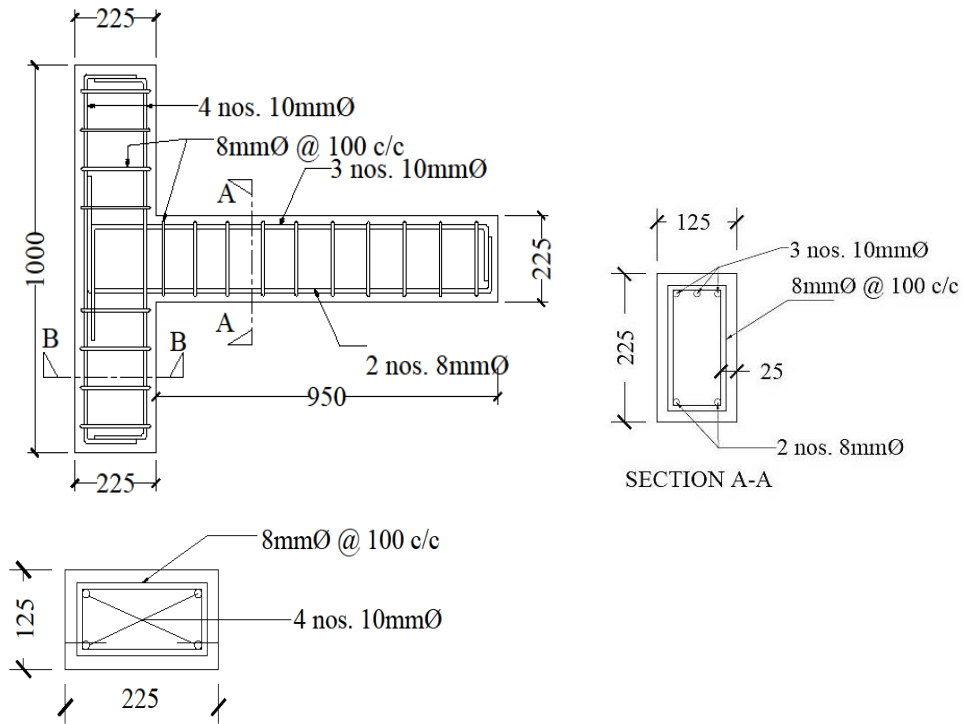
Reinforcement Detail of RC Exterior Beam Column Joint
